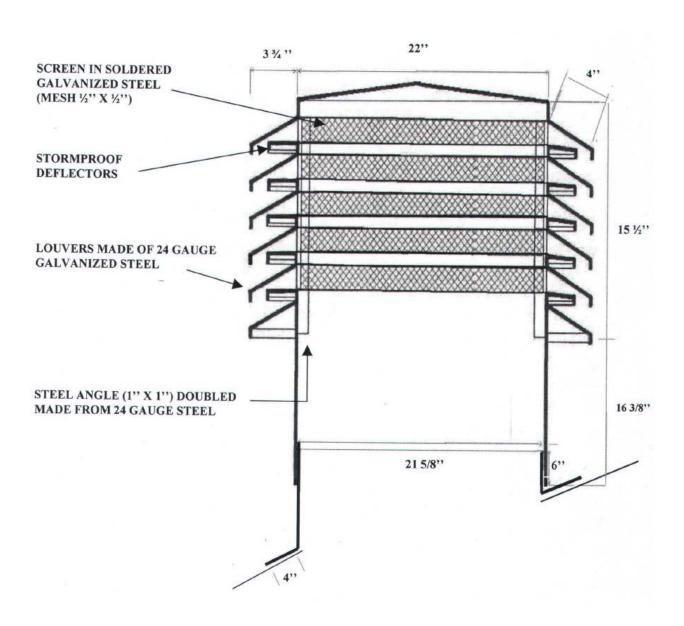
# DETAIL DRAWINGS (CONT.) ROOF VENTILATOR #301 (20 x 20)
